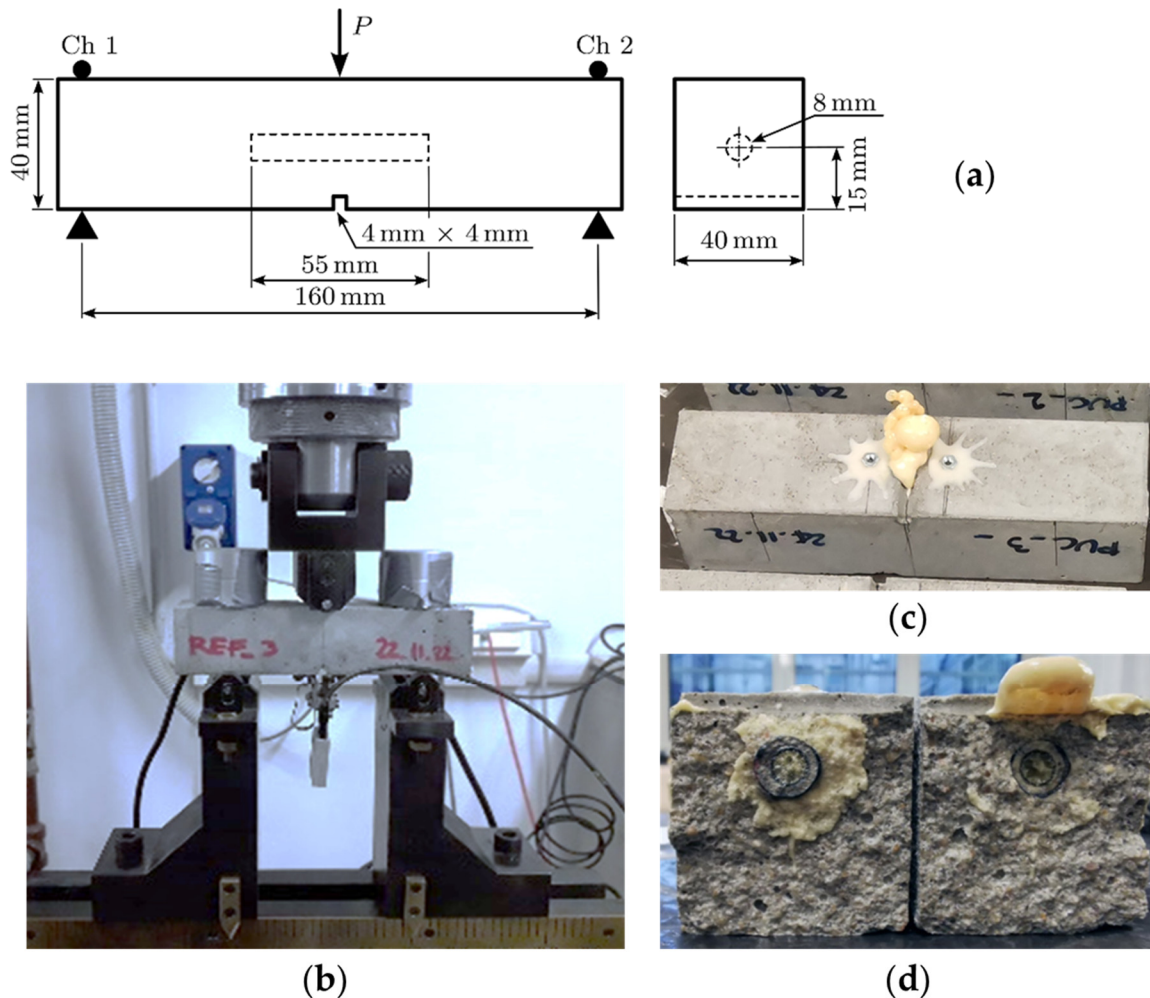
(a) Schematic of the testing procedure and the specimen dimensions, (b) one of the tests performed in laboratory and, a specimen (c) after pre-cracking and (d) after a reloading test, where the resin expansion can be clearly observed. Adapted from [70,74], under the terms of the CC BY and CC BY-NC-ND licenses, respectively.
